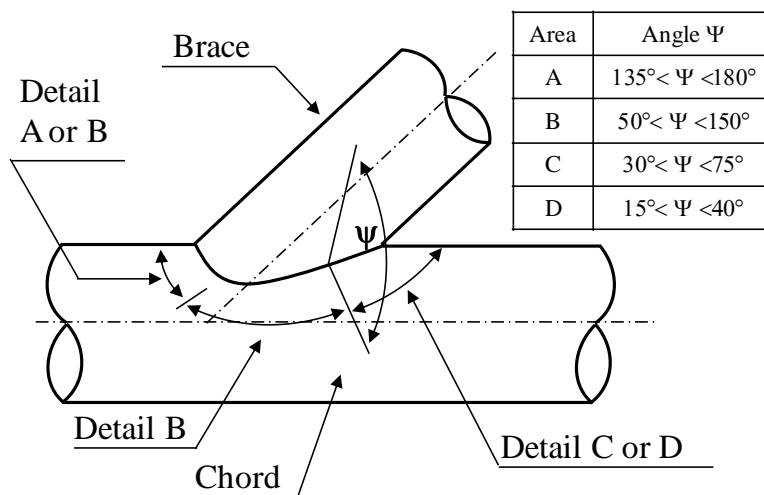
Definition of weld profile for T-, Y-, and K-tubular connections (AWS, 2012).
